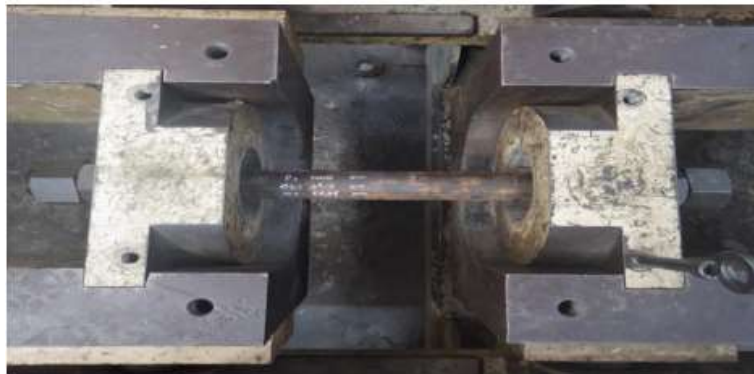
Position of Anchor Bolt Placement on RH-Z Machine of Top View
